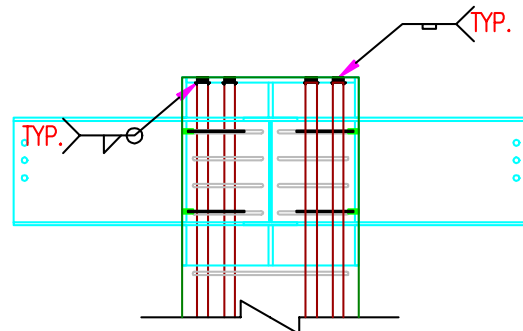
Elevation of beam-column joint detail with steel cap plate at roof level
